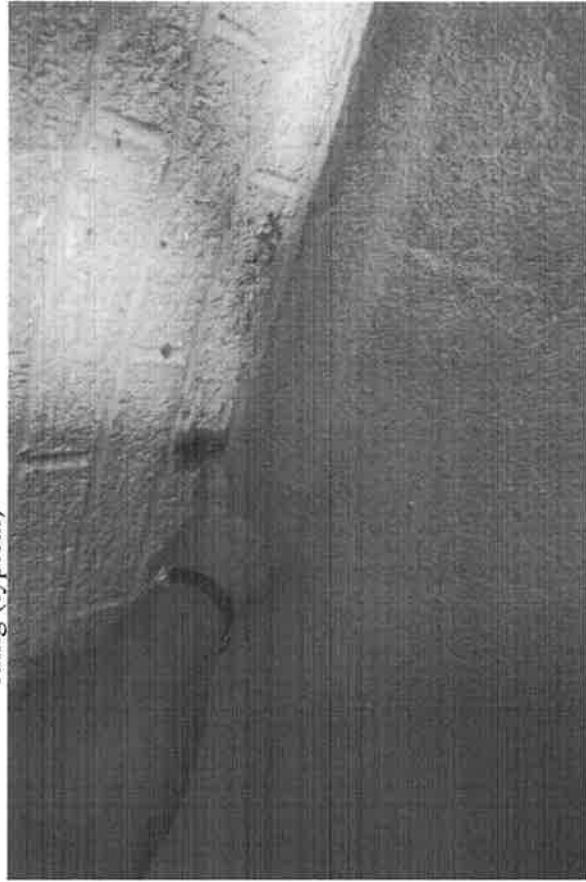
Sealant installed to block weep holes at west side of building (typical)
